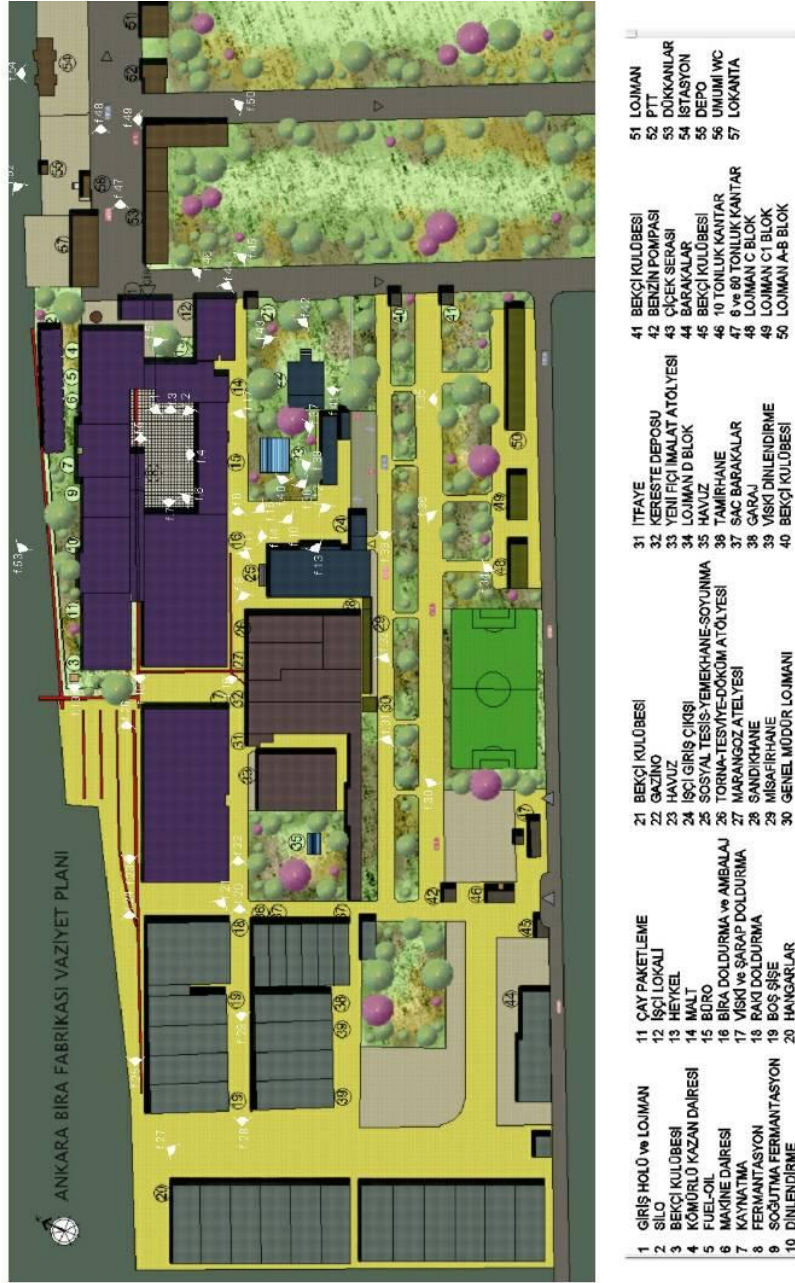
AOÇ site plan (FEROĞLU, 2008)
